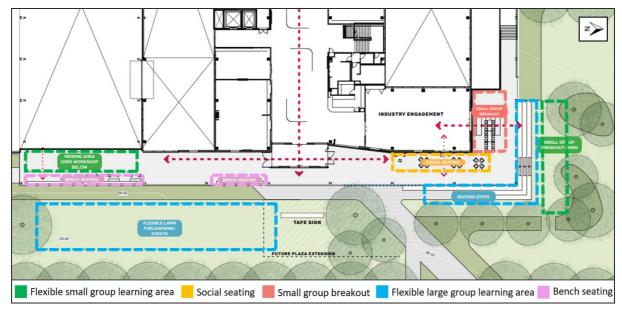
| Upper Ground Floor landscaping and outdoor learning spaces (Source: Applicant's RtS)
